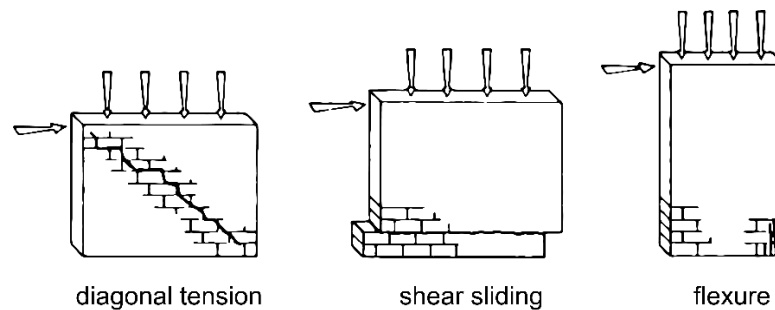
Typical failure modes of URM walls under in-plane loading (adapted from [4]).
